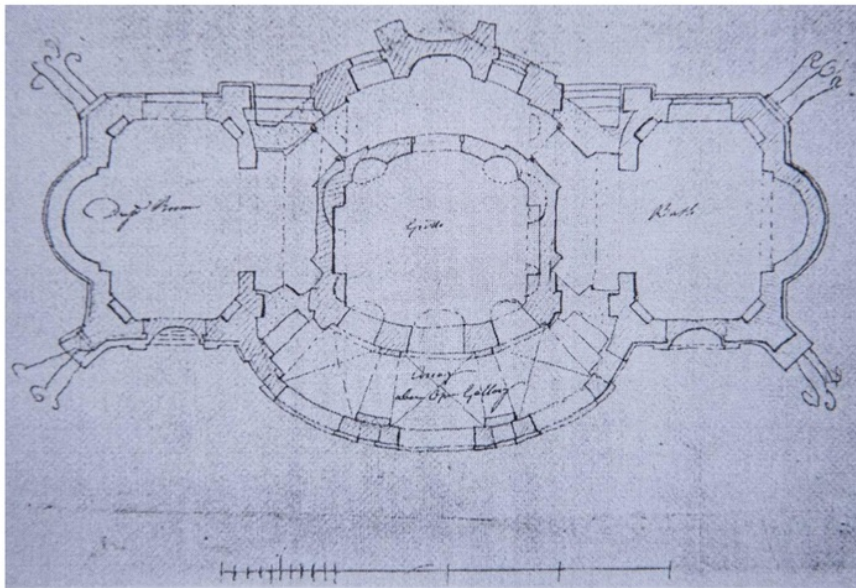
Plan of Lord Lincoln's grotto, 1766.
